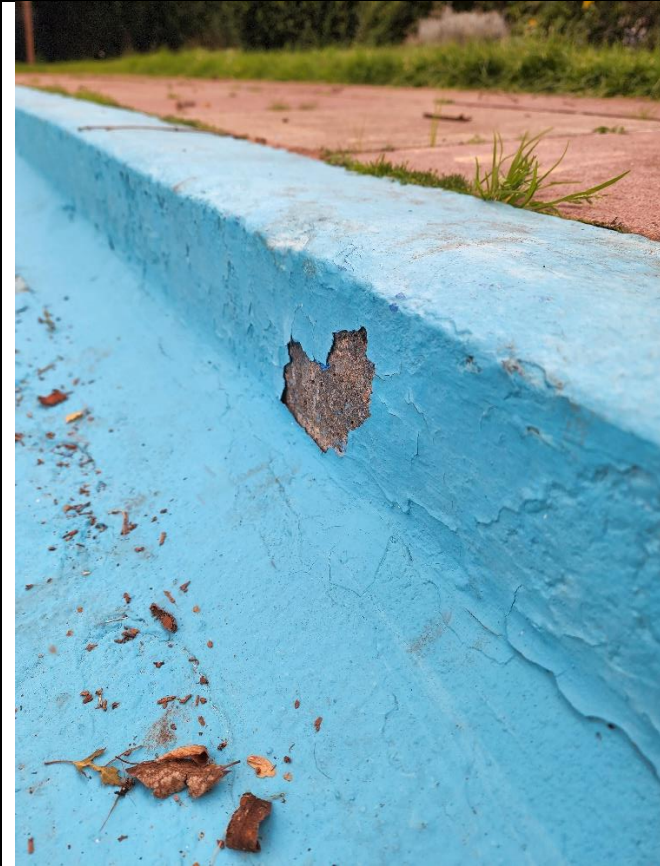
1 isolated paint delamination to the upstand wall of the pool tank
